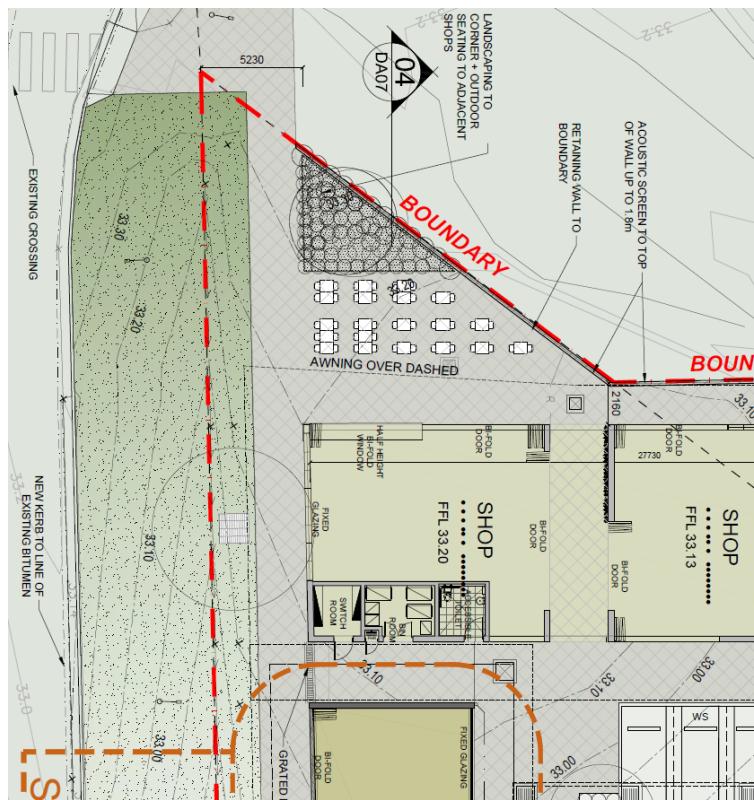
Extract from the Applicant's Ground Floor Plan demonstrating the proposed embellishment of the Town Plaza, being landscaping, paving, outdoor tables and seating adjacent to the shop, boundary retaining structures with acoustic screening above up to 1.8 m in height.
